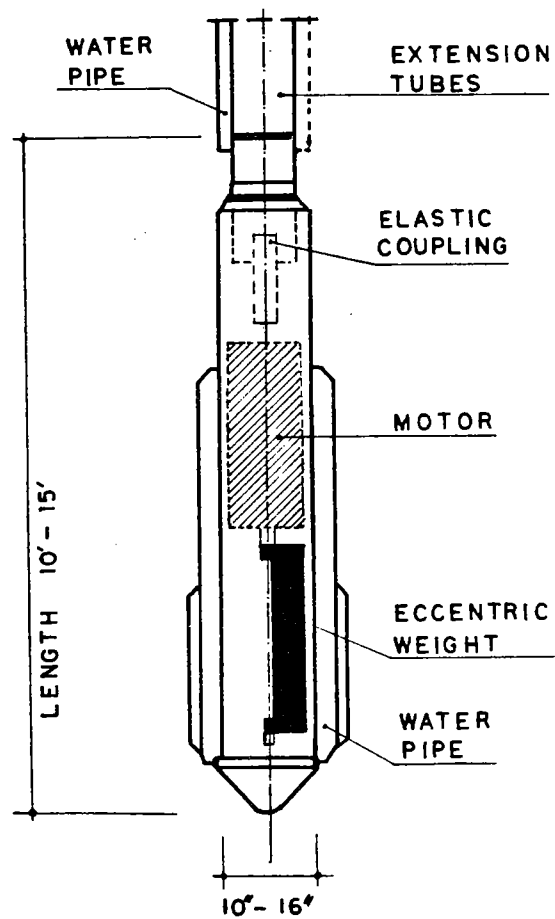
TYPICAL VIBRATOR USE FOR STONE COLUMN CONSTRUCTION.
